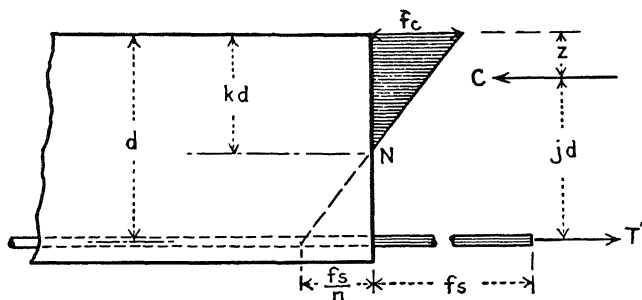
Nomenclature for Concrete Beam Reinforced for Tension.
